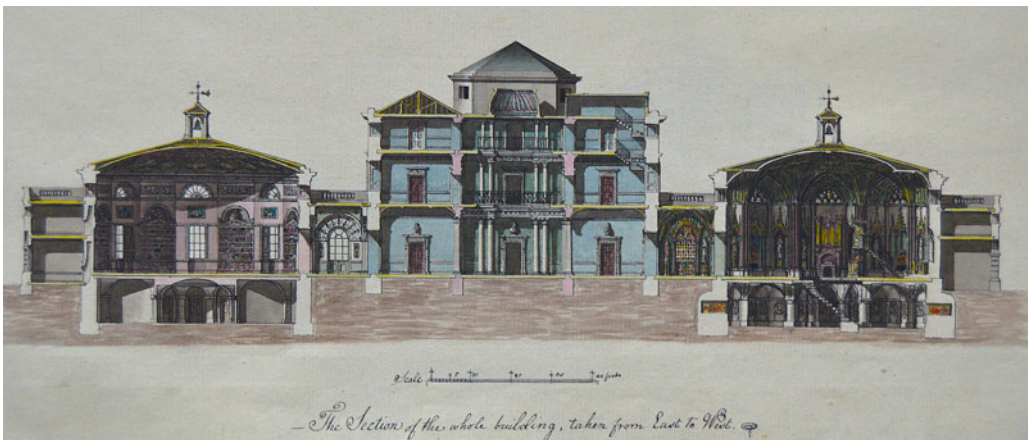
John Carter, east-west cross-section of Bywell Hall. *Photograph*: author.
